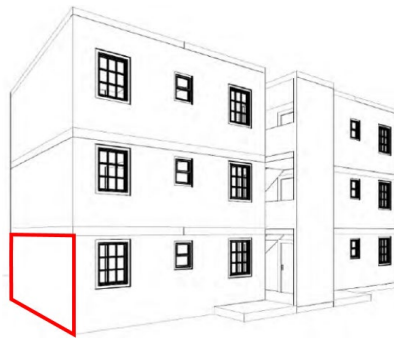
Proposed LWFC building (Dunn, van Zijl, and van Rooyen (2018))
